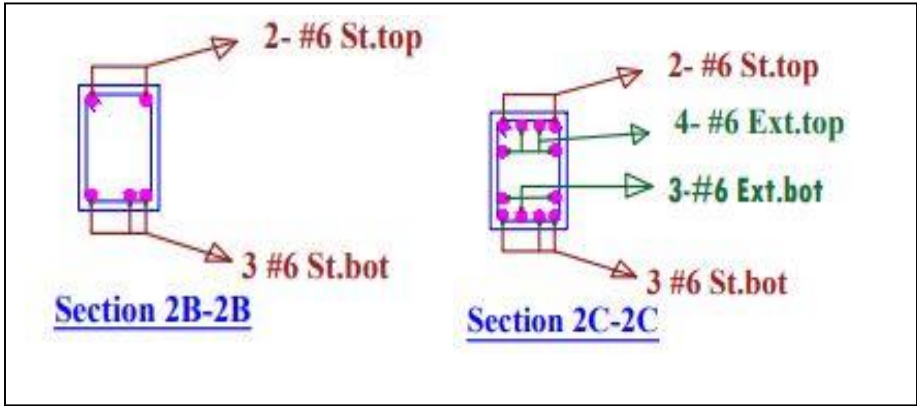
Beam Detailing & Cross Section of Y-axis
